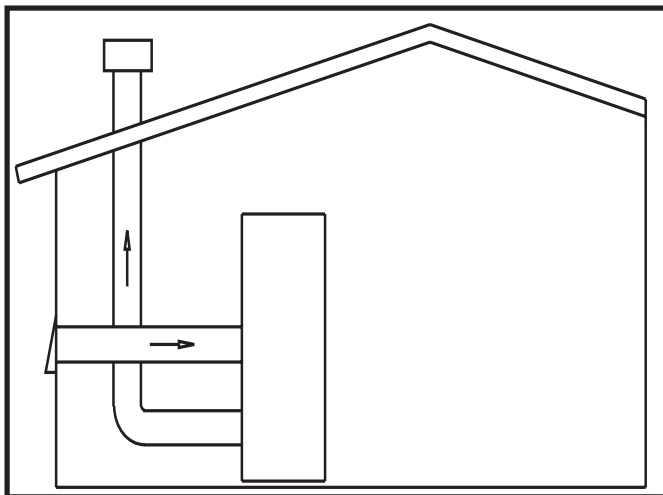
Vertical DirectAire Installation with Sidewall Combustion Air Inlet
